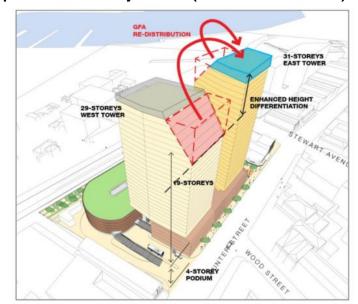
Concept Master Plan Adjustment (Source: Bates Smart).
